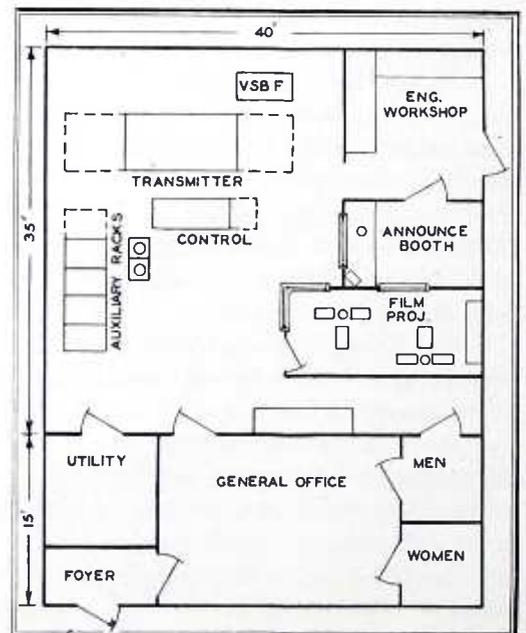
A MINIMUM-TYPE STATION FLOOR PLAN
